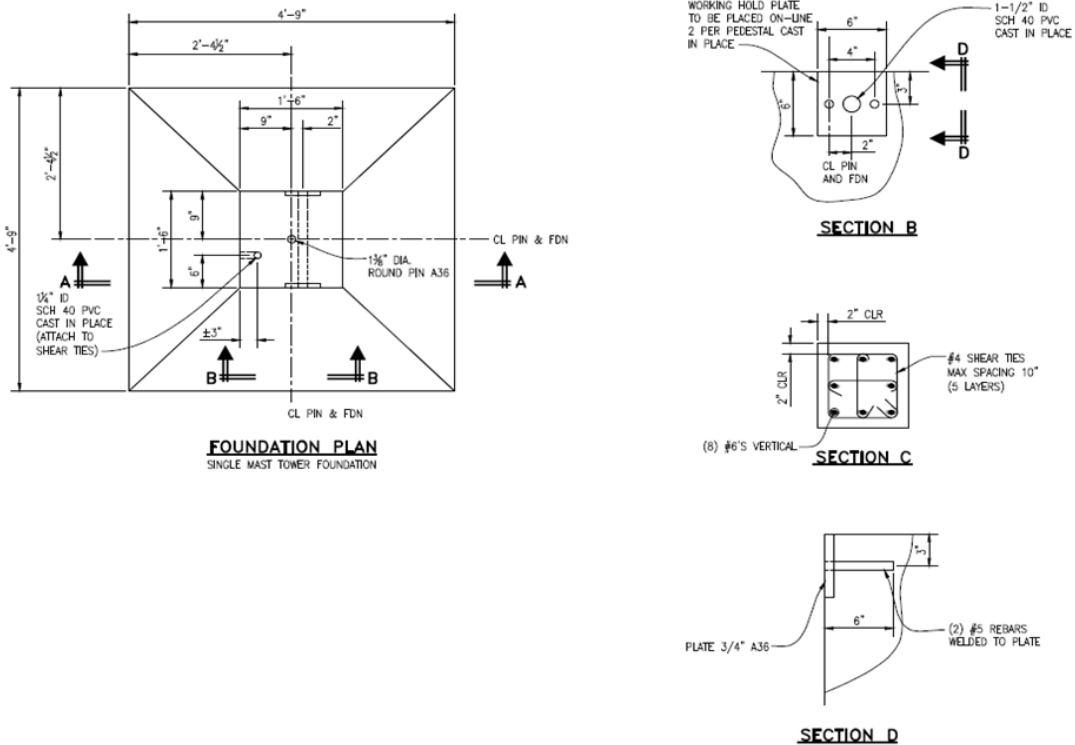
Aluminum Tower Foundation Single Mast Tall (026-82458)
